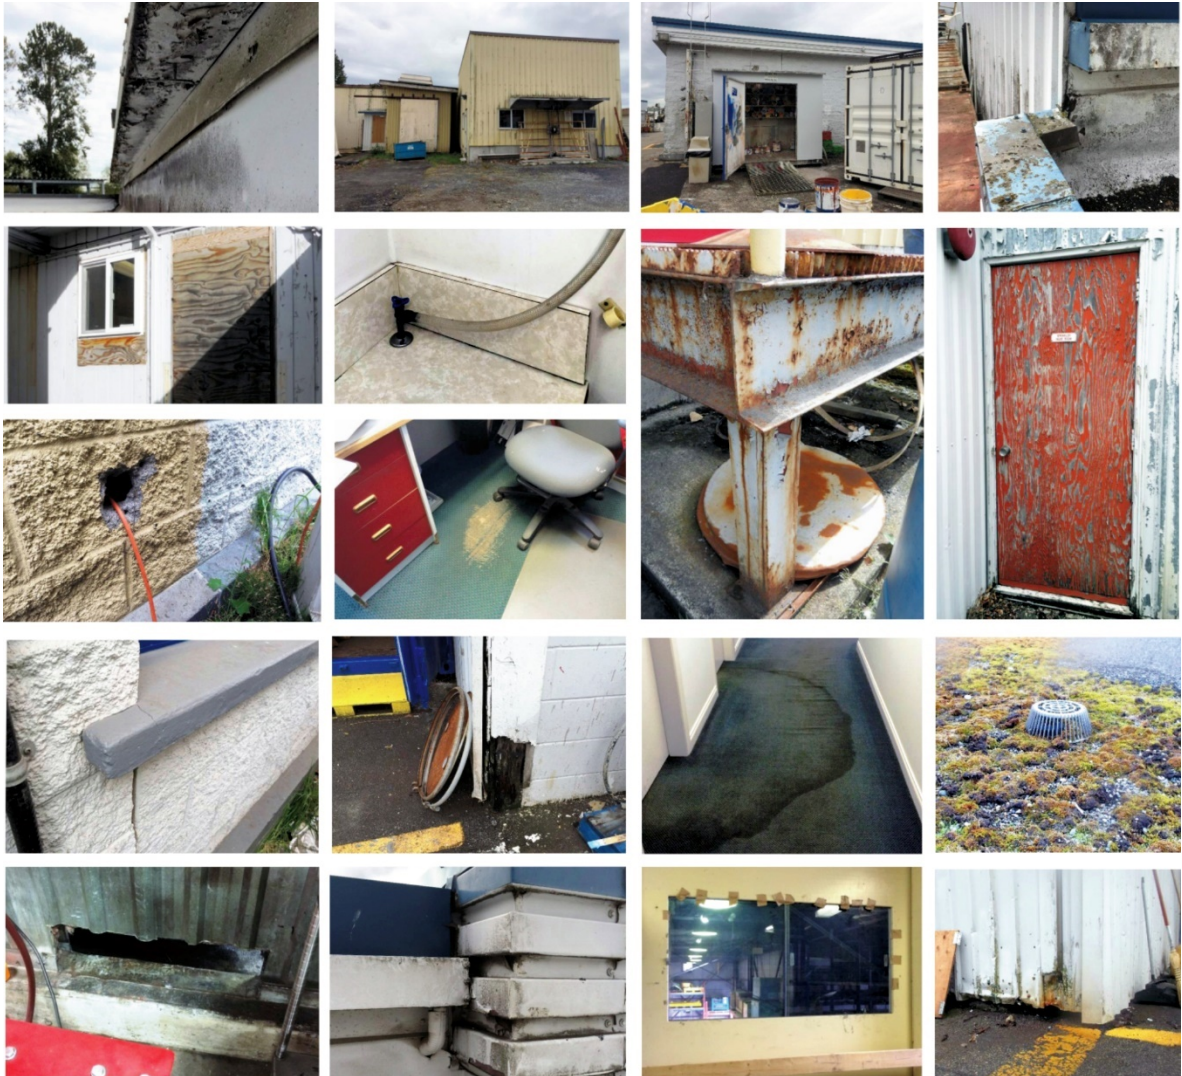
COMPILATION OF BUILDING CONDITION PHOTOS
